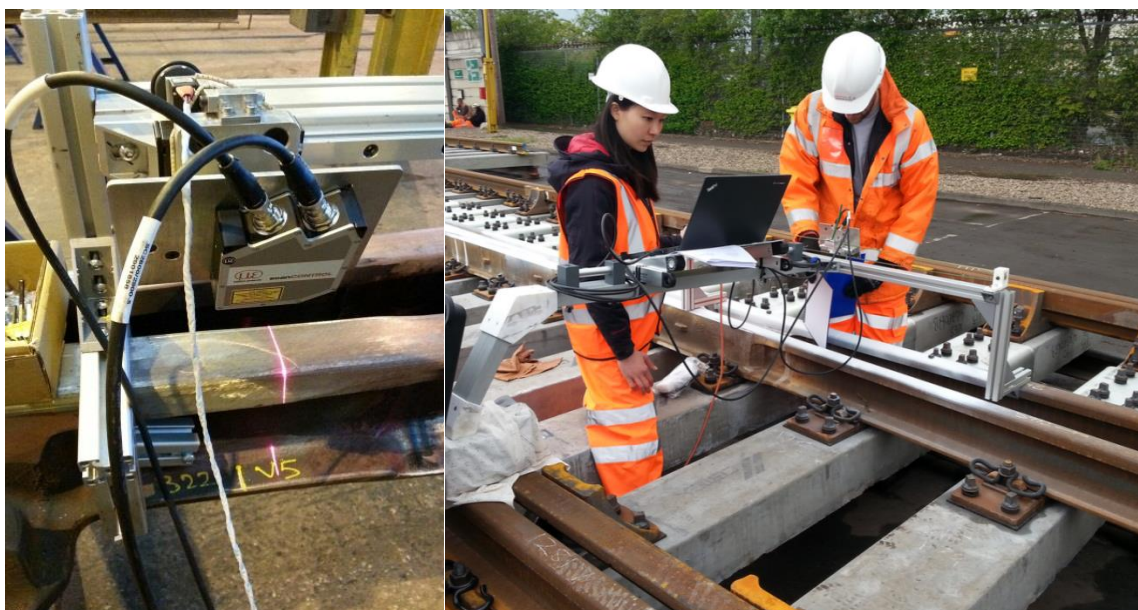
UoH Laser measurement trialed on crossing welded leg end (left) and on full S&C Assembly (right)
